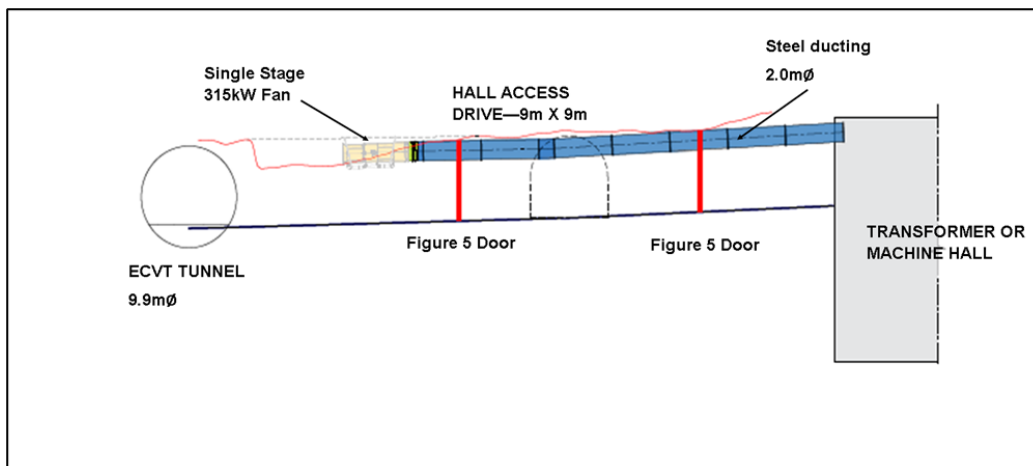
Fan / Door Layout (Snowy Hydro Ltd, 2024)
